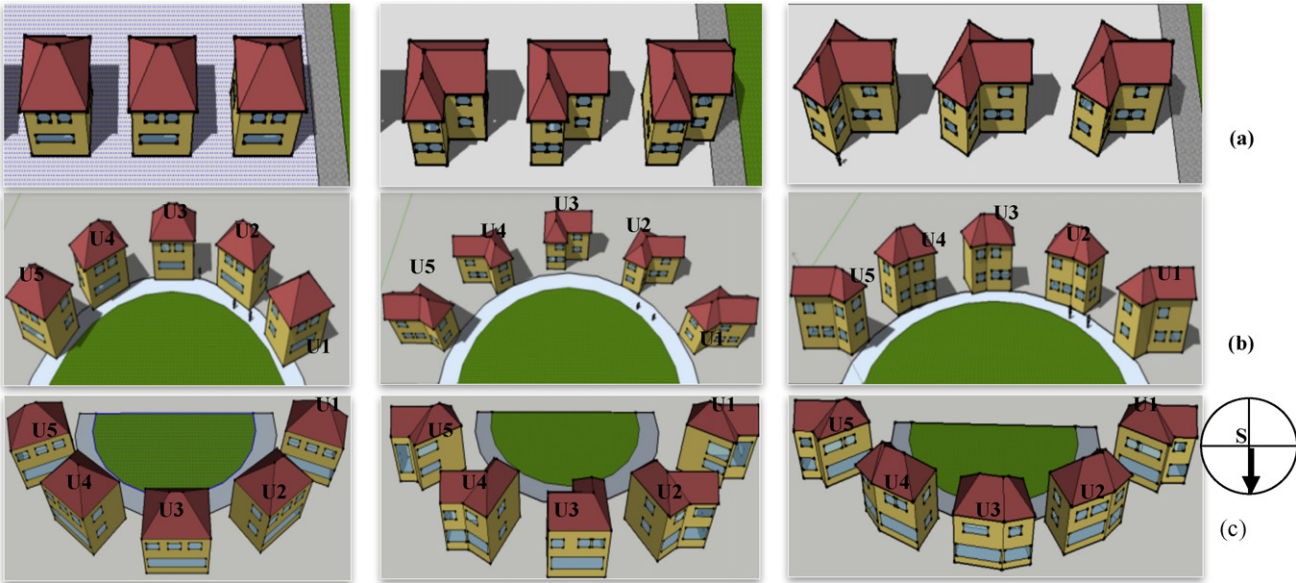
Configurations of shapes used in different site layouts: (a) site layout I; (b) site layout II; (c) site layout III.
